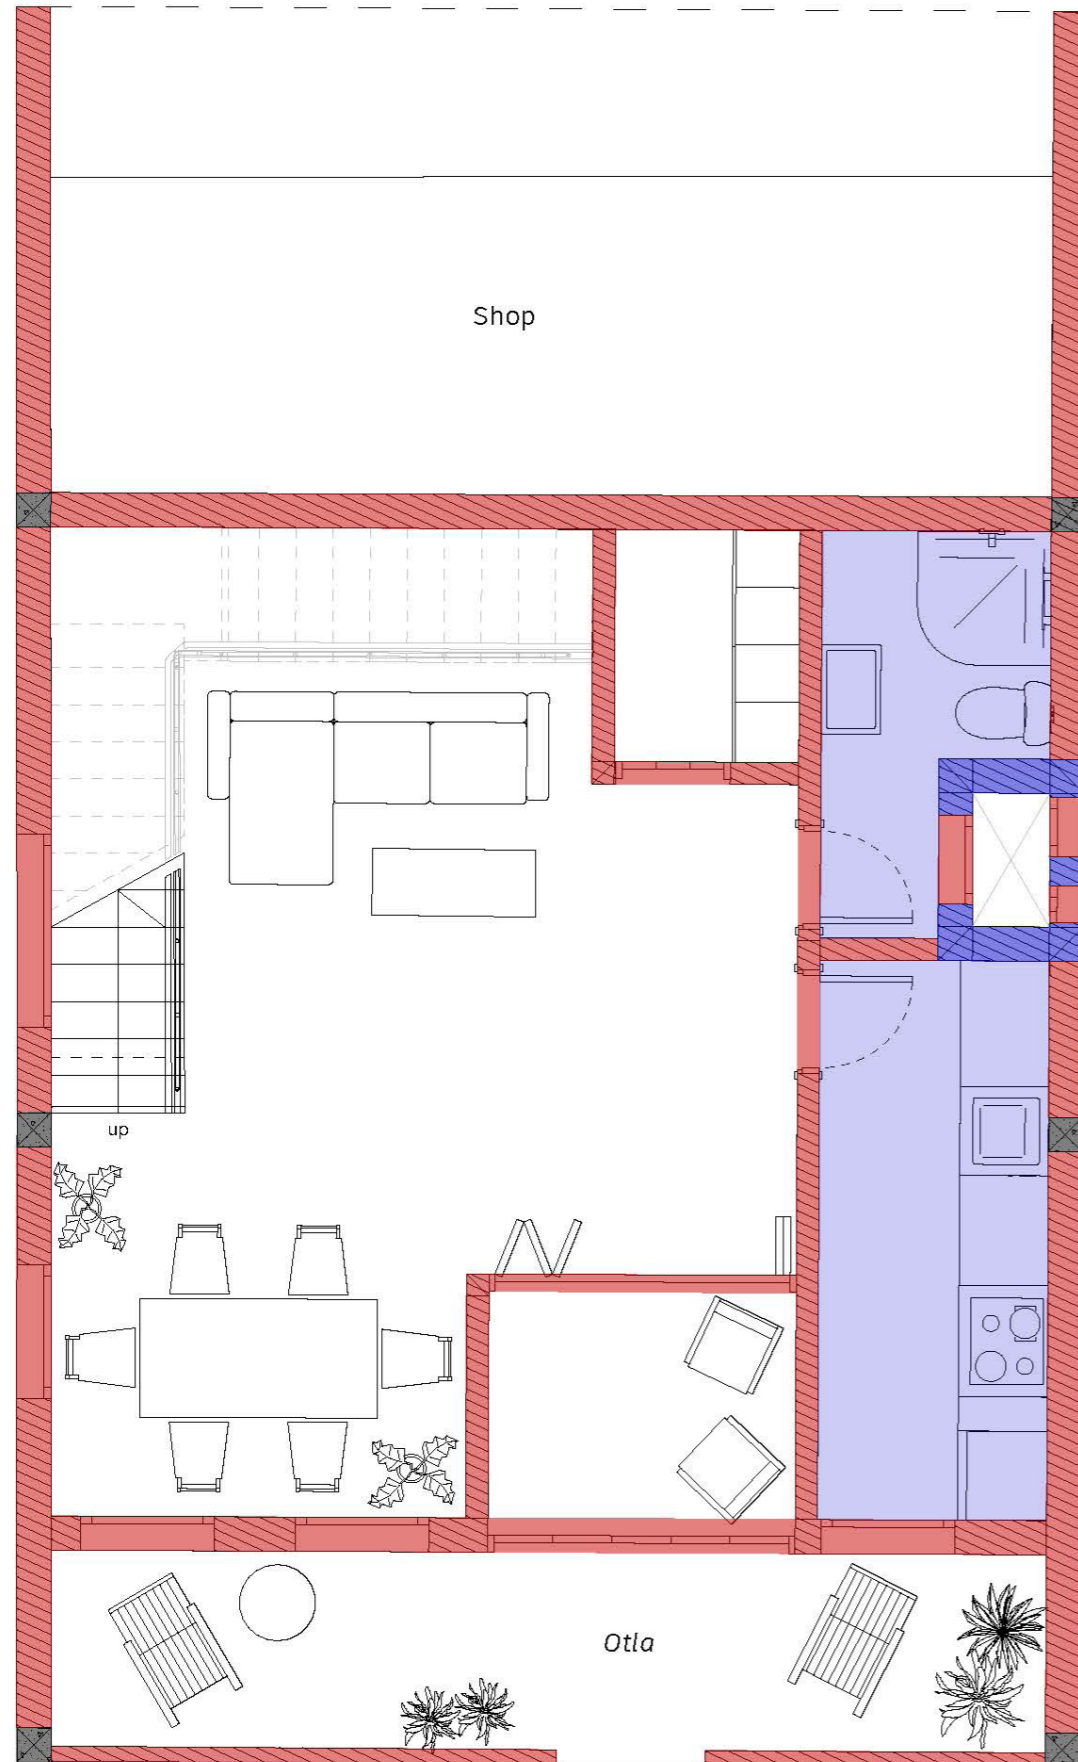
Groundfloor of a type A apartment (author's work, 2026)
